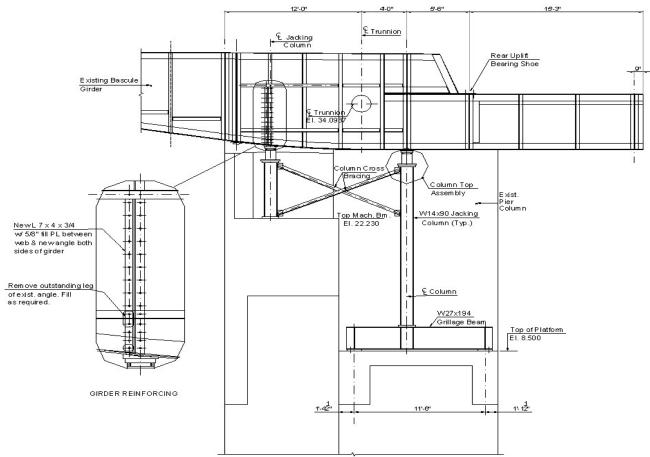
Elevation view of jacking system under one girder of Wappoo Creek Bridge.
